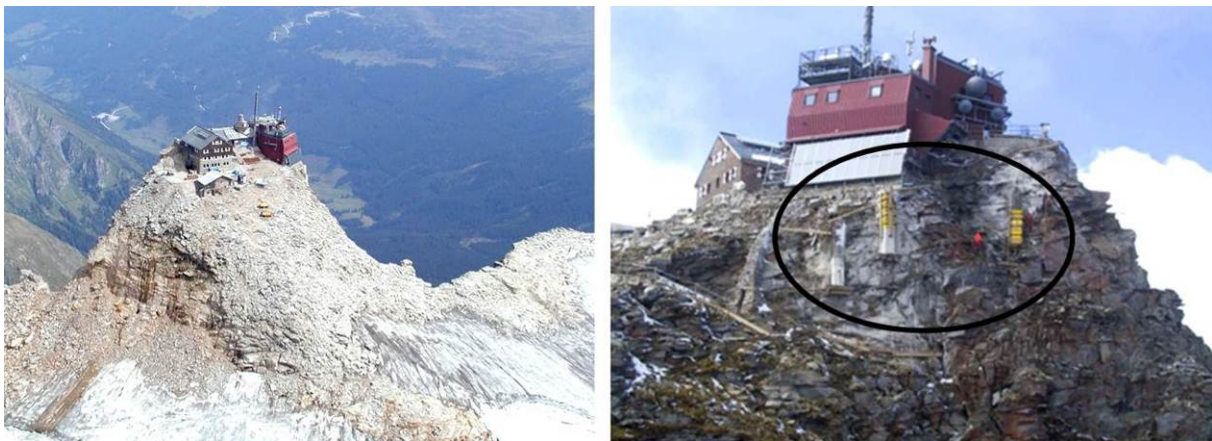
Sonnblick summit with observatory and Zittelhaus (left), constructions to stabilize the summit area (right) (Photos by M. Staudinger).
